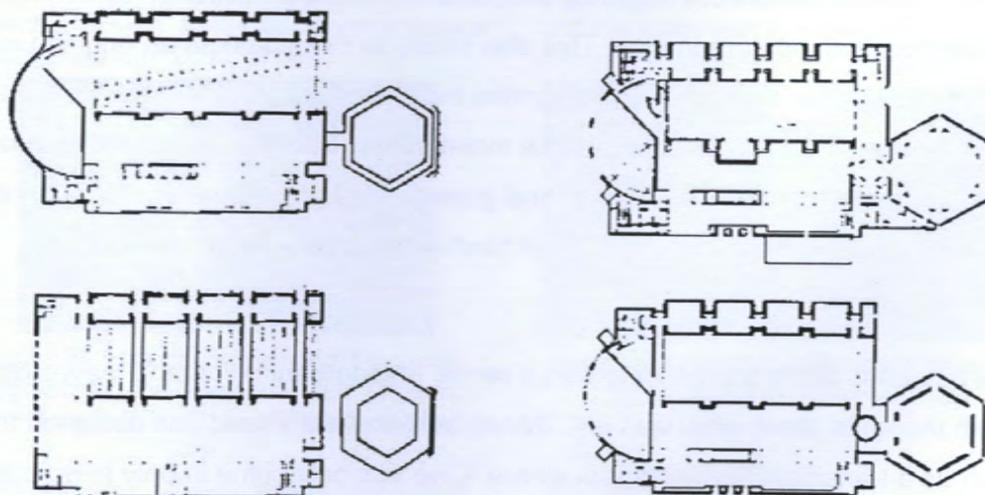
Holocaust Memorial Museum- floor plans from 2nd to 5th floor (Source: American Studies at University of Virginia)
